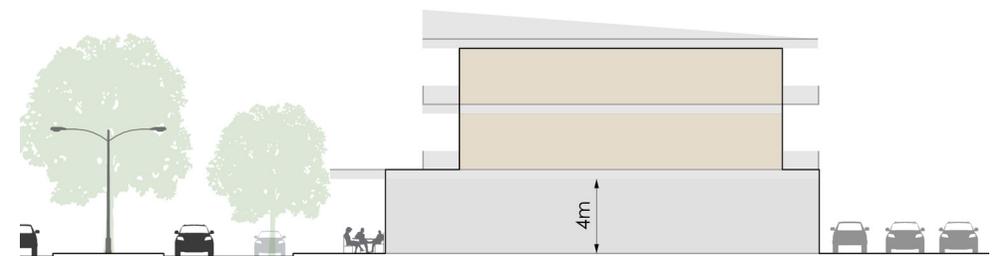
The minimum floor to ceiling height is 4m for the ground floor of development within areas annotated as 'Active Frontage Required' or 'Adaptable Ground Floor Required' in Figure 9 and Figure 13.
